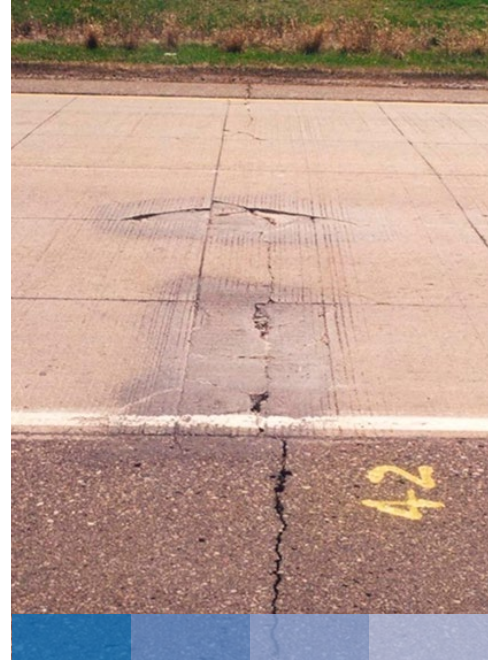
Example of reflective crack in COA-B caused by failure to match joint location or provide reinforcing steel over crack. Photo: Julie Vandebossche, Univ. of Pittsburgh.
